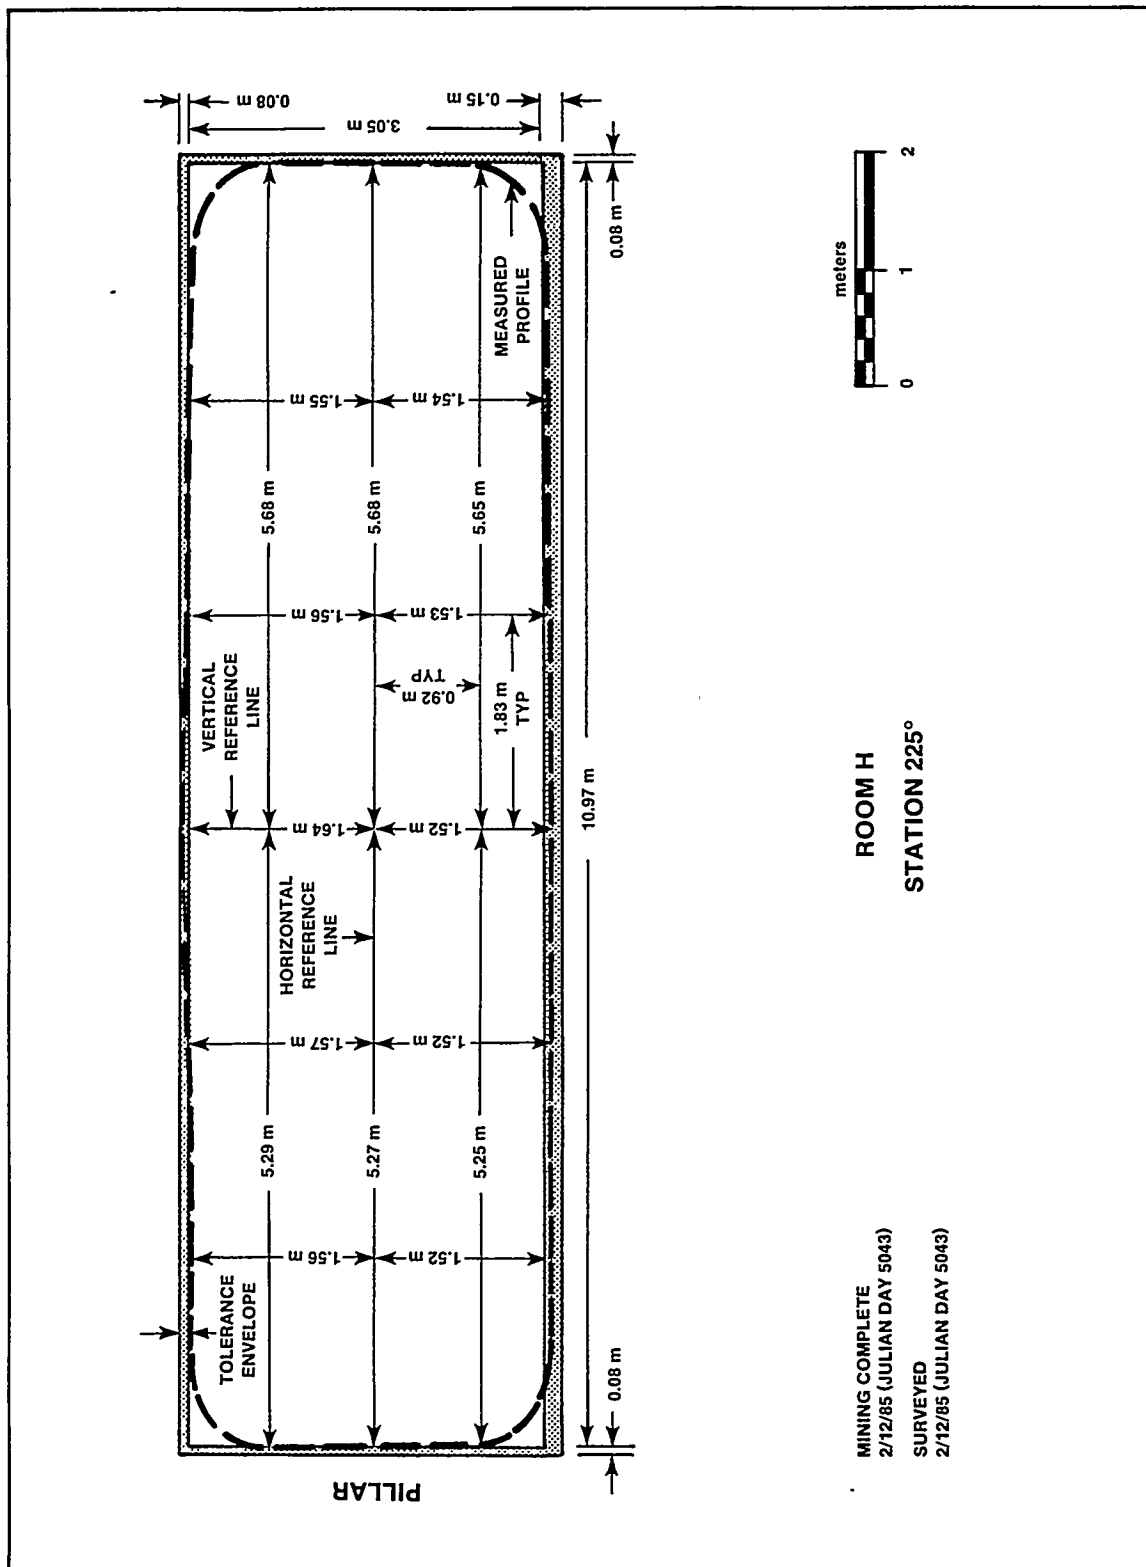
As-Built Cross Section of Station 225°, Room H
